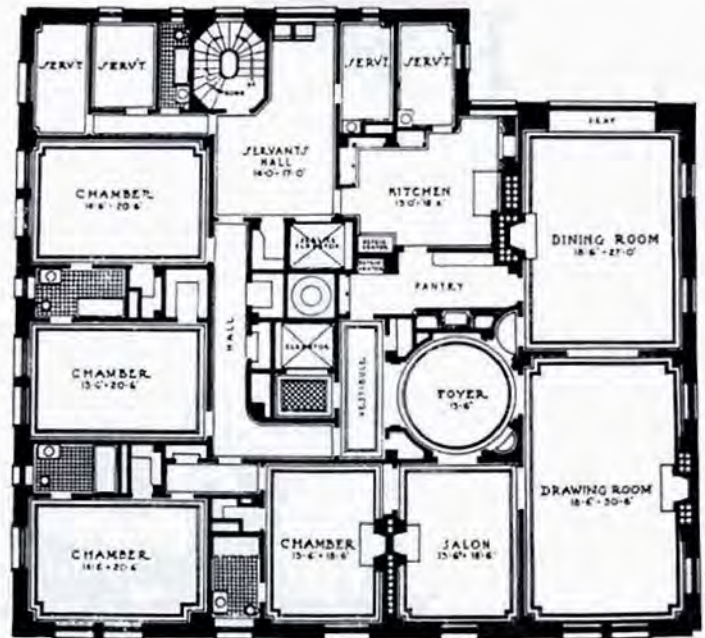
635 Park Avenue. J.E.R. Carpenter. 1912. Plan of typical floor.
